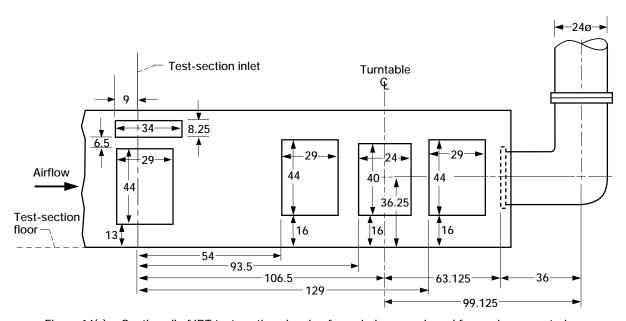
(a).—South wall of IRT test section showing four windows as viewed from primary control room (all dimensions are given in inches).
